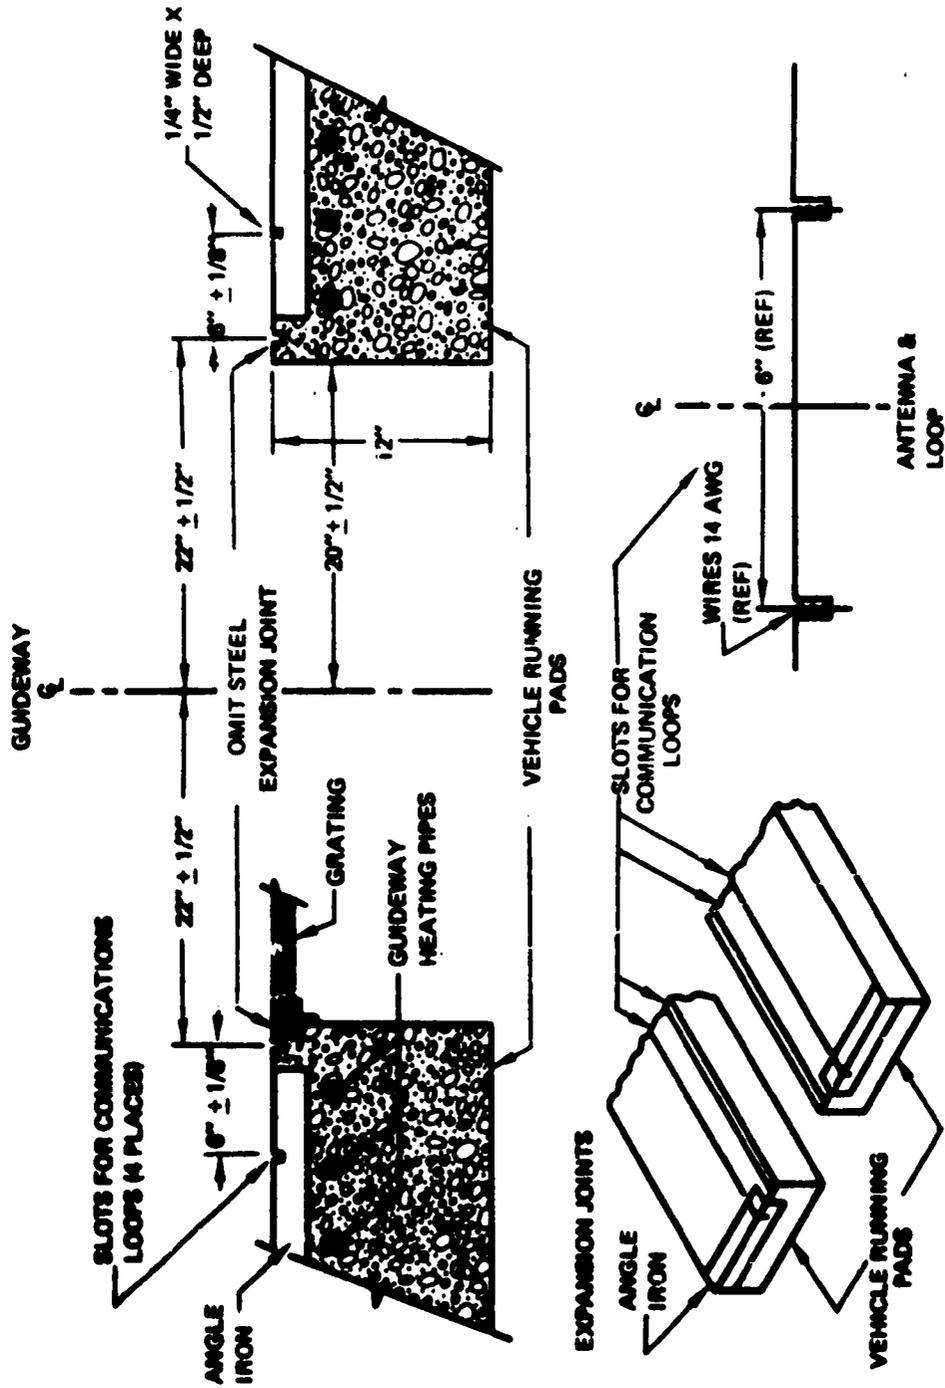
Typical Vehicle Running Pads - Elevated Guideway
